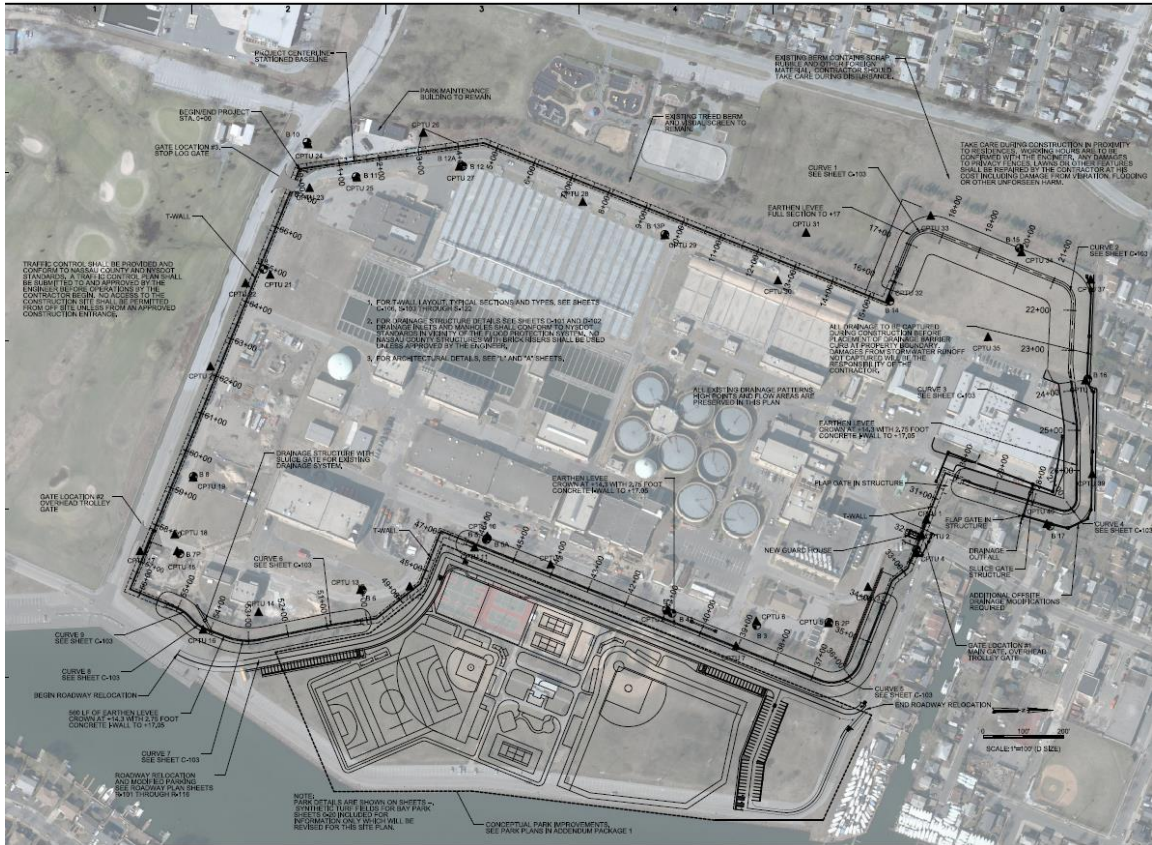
Bay Park WWTP Protection Plan (Courtesy of Google Images)
